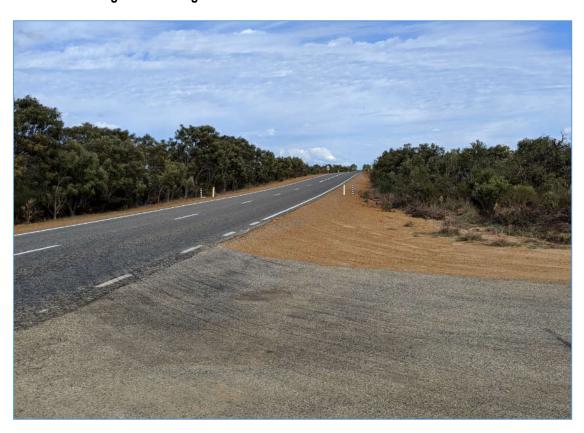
Brand Highway / Wongonderrah Road Intersection Looking South
